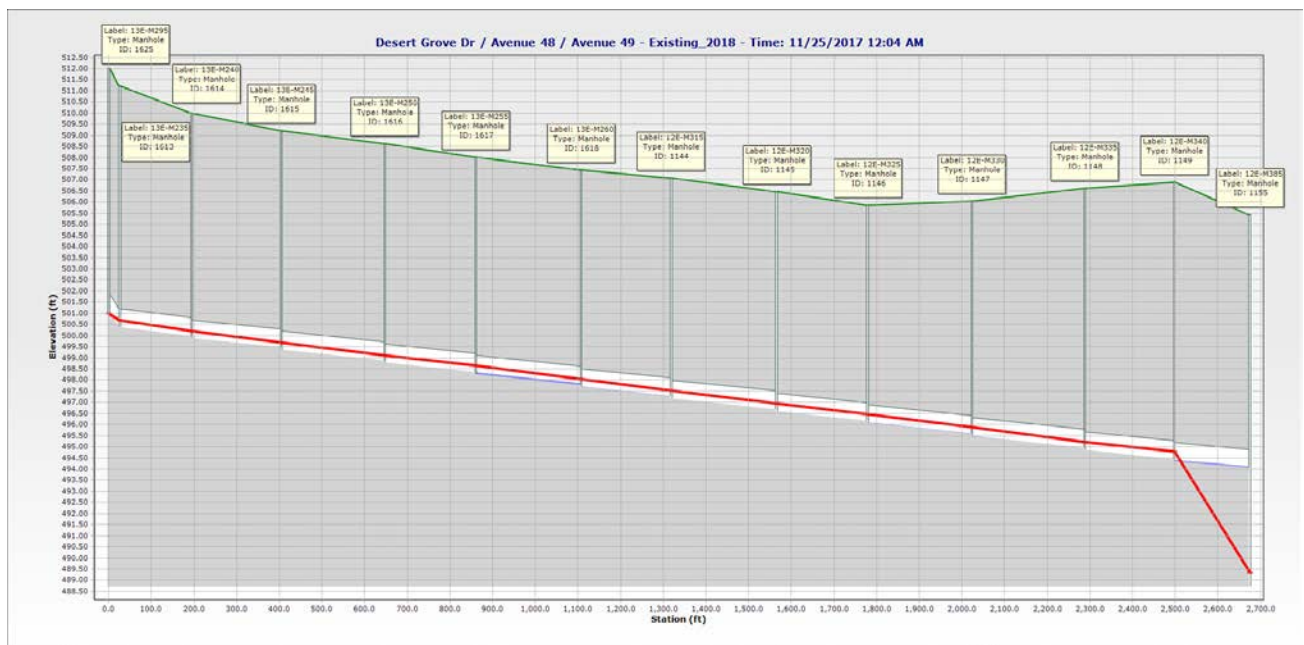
Desert Grove Dr between Avenue 49 and Avenue 48 under Existing Conditions
